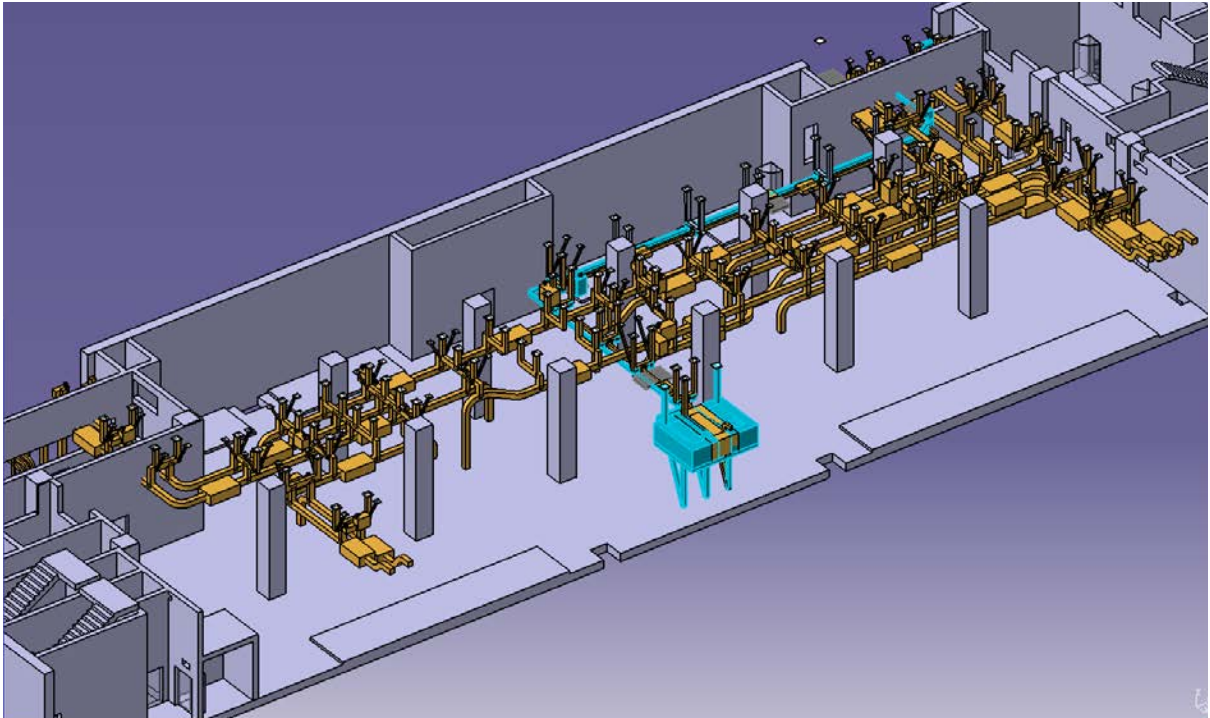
Layout of the ceiling embedded Busbars in Building 74. Level L3 [8]
